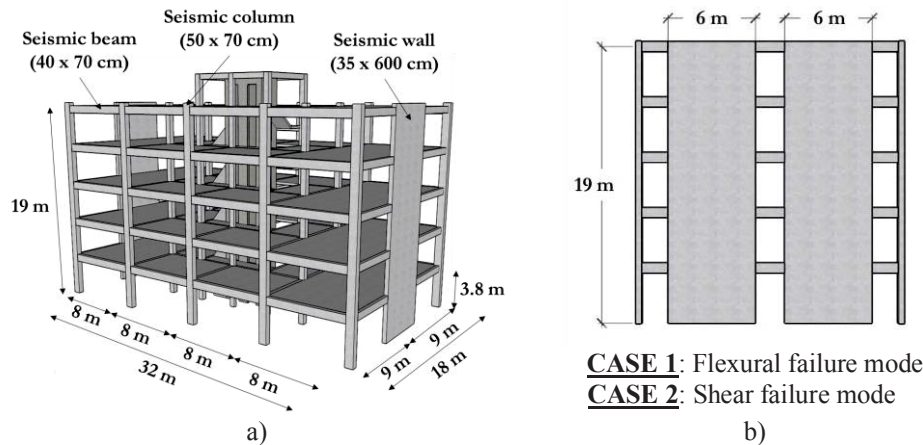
a) Global view of the reference building (Bianchi et al. [38]; b) new geometrical configuration designed in the wall direction (Case 1: flexural collapse; Case 2: shear collapse)
